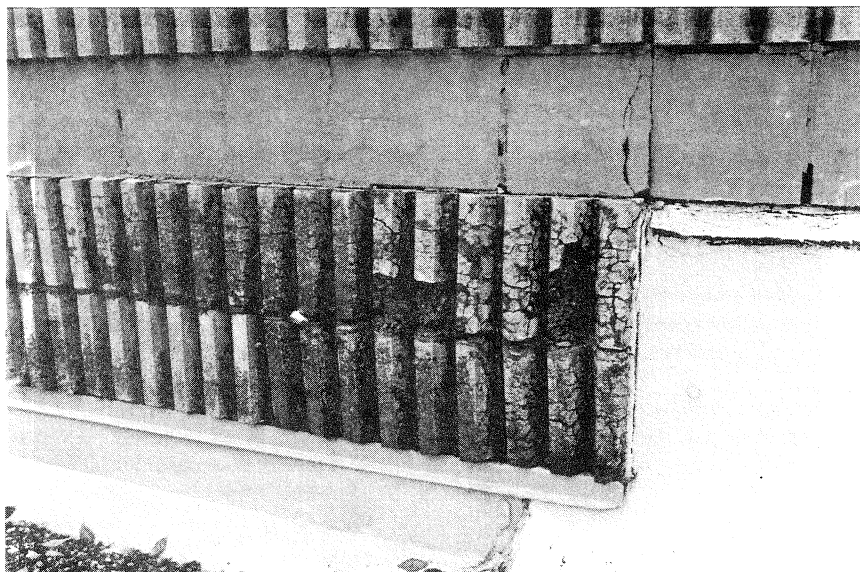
Badly Fractured Concrete Block Cladding
